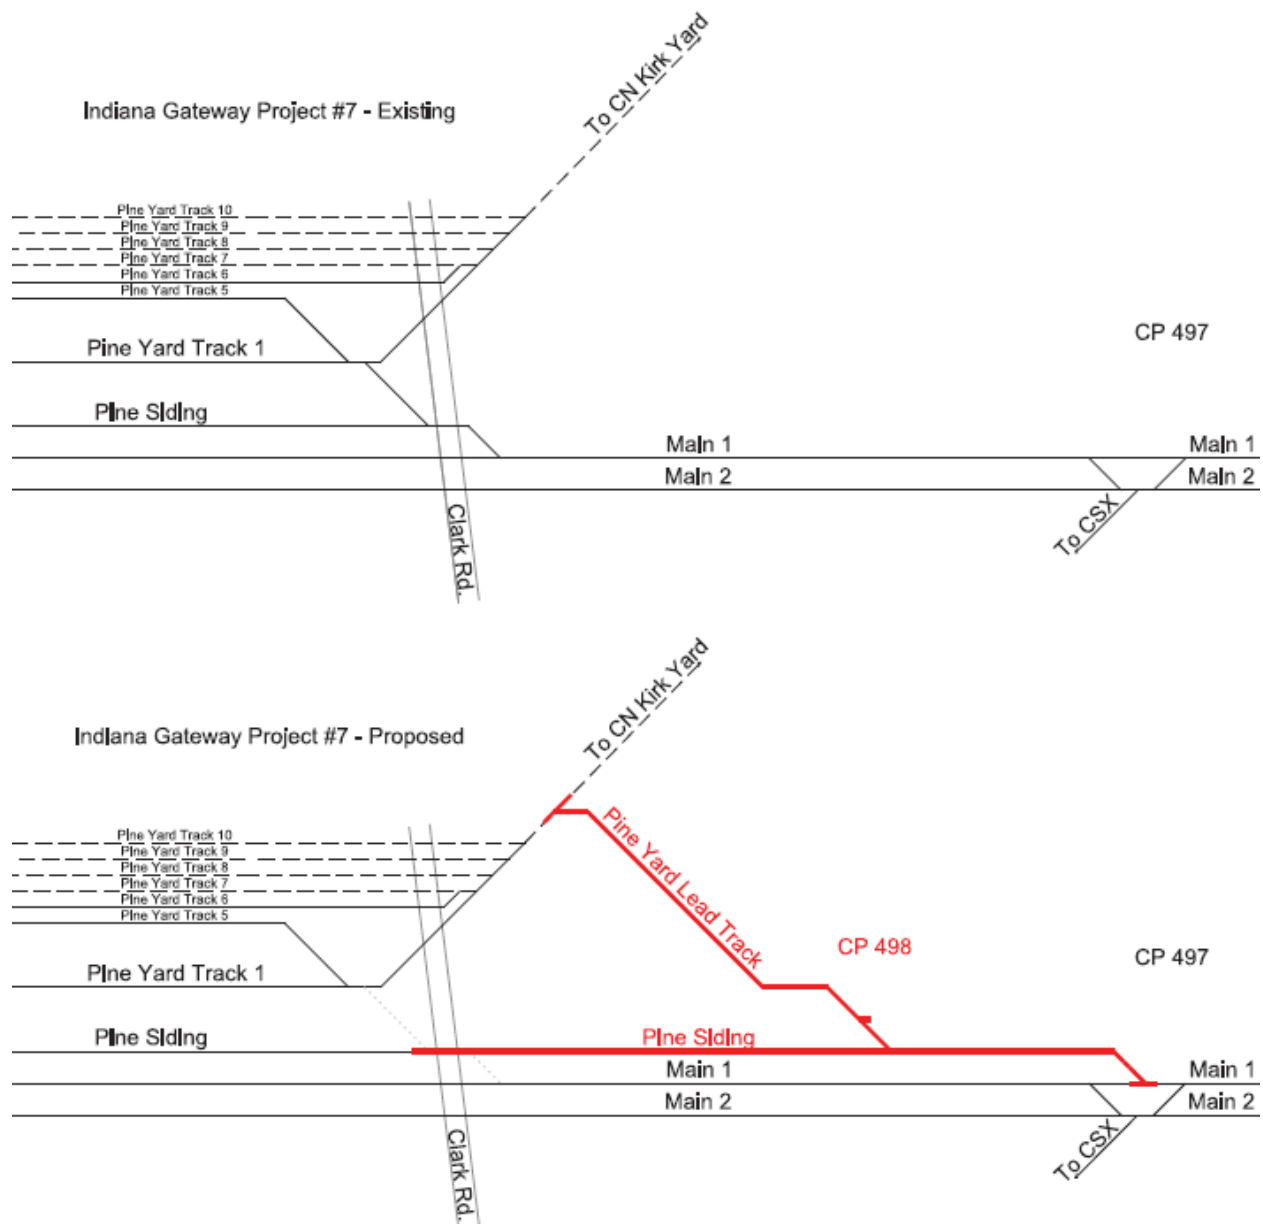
Pine Yard Indiana Gateway Schematics, Existing and Proposed
